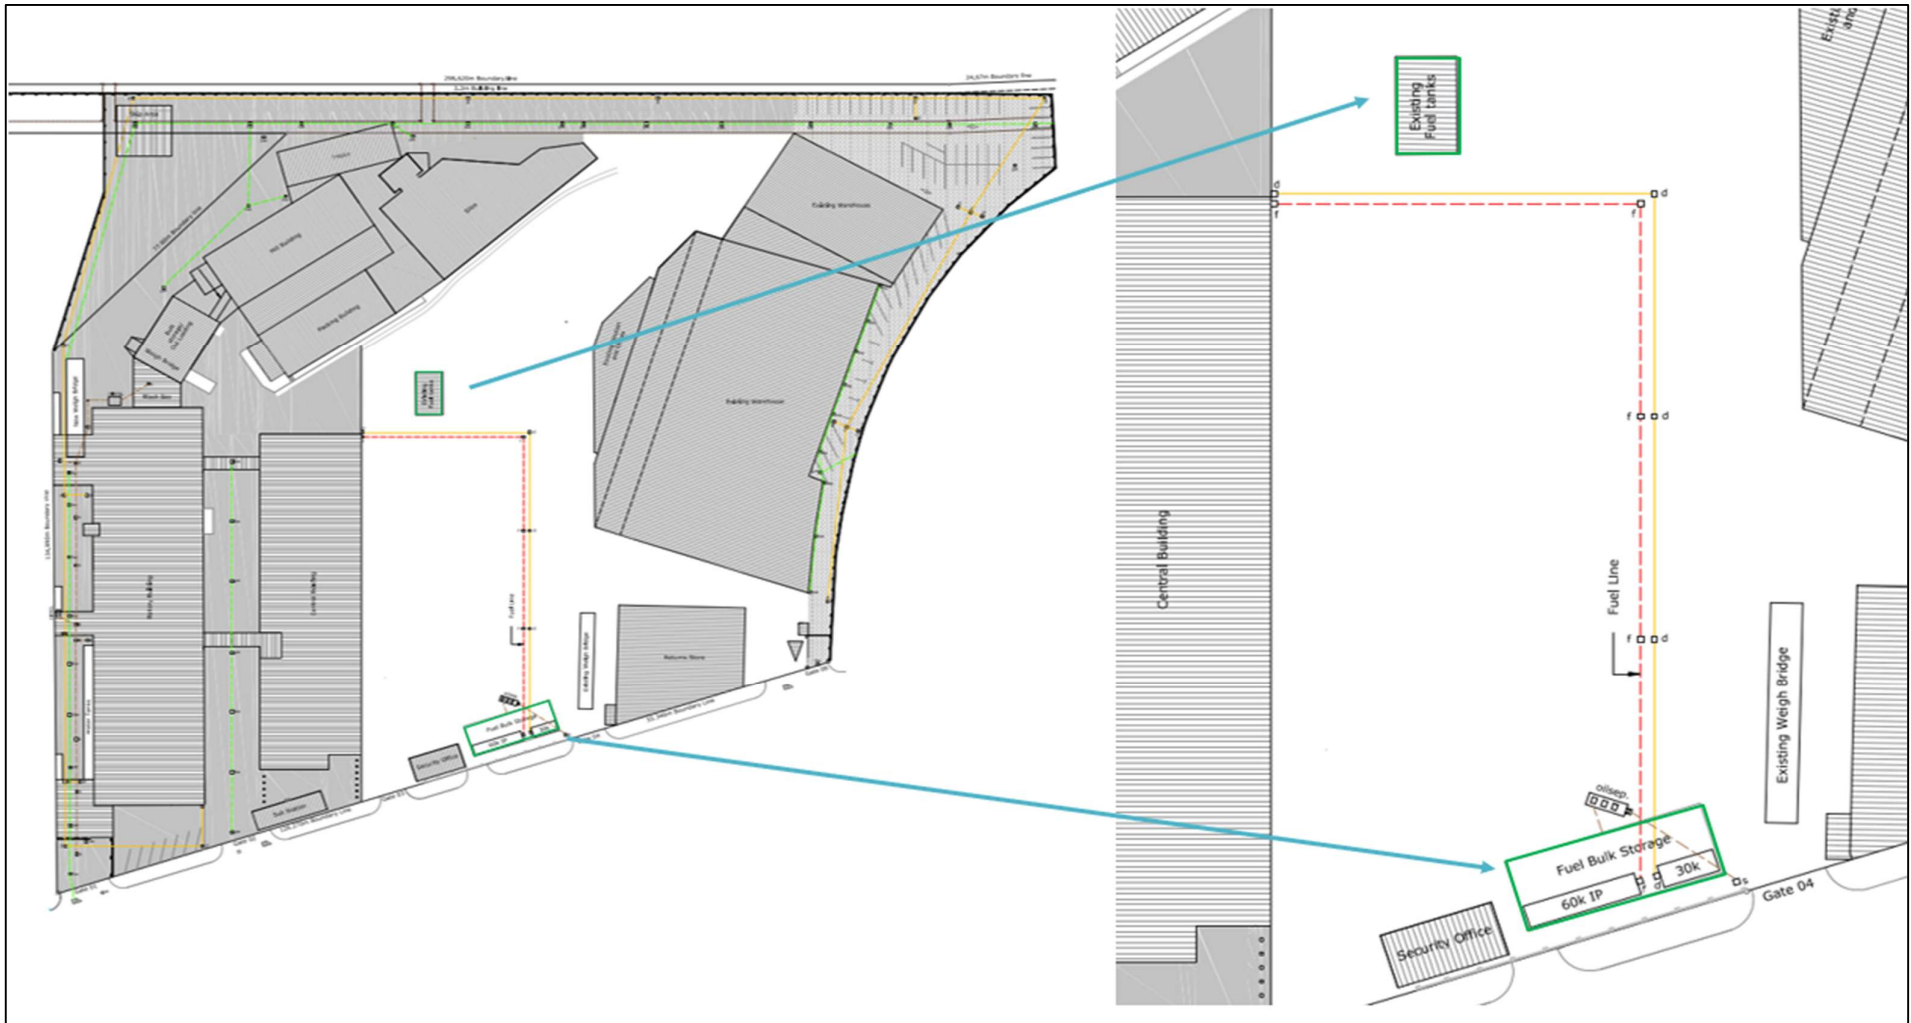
Site layout highlighting the exact location of the tanks within the site.
